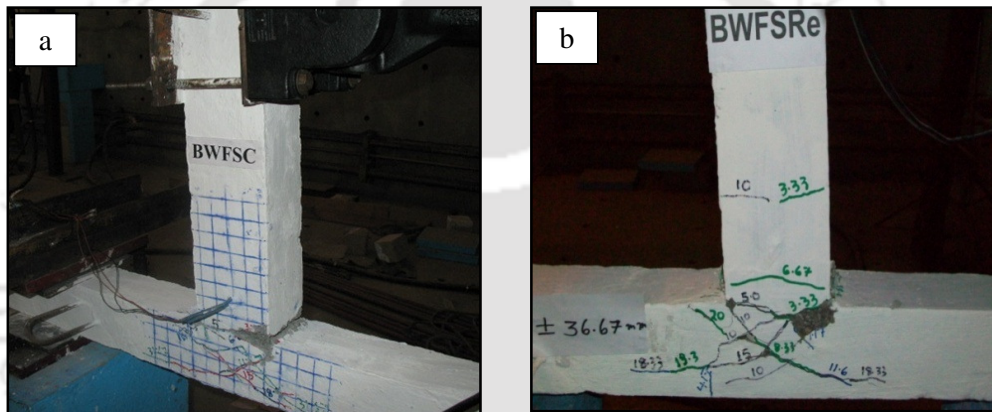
BWFS specimens at the end of test under loading type-1:
